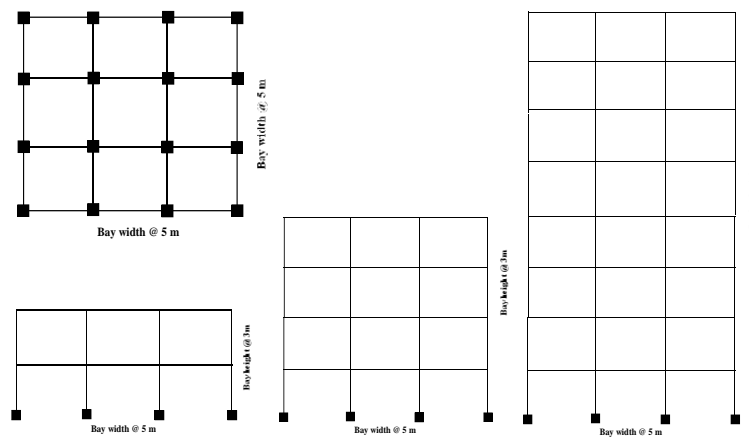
Plan and elevation of 2, 4 and 8 story RC frame structures
